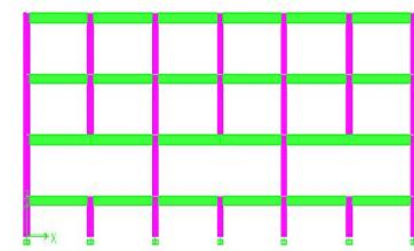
Columns removed in middle of interior frame in ground floor (Section view A-A)
